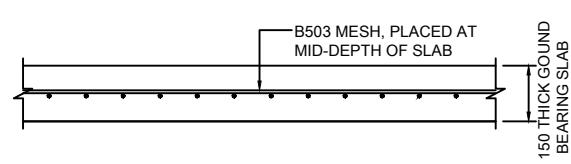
DETAIL OF TYPICAL SLAB OF VARIED THICKNESS
